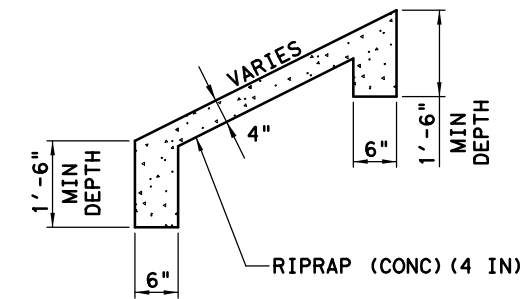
DETAIL C: RIPRAP CONC @ CULVERT # 22 STA 322+22.00
